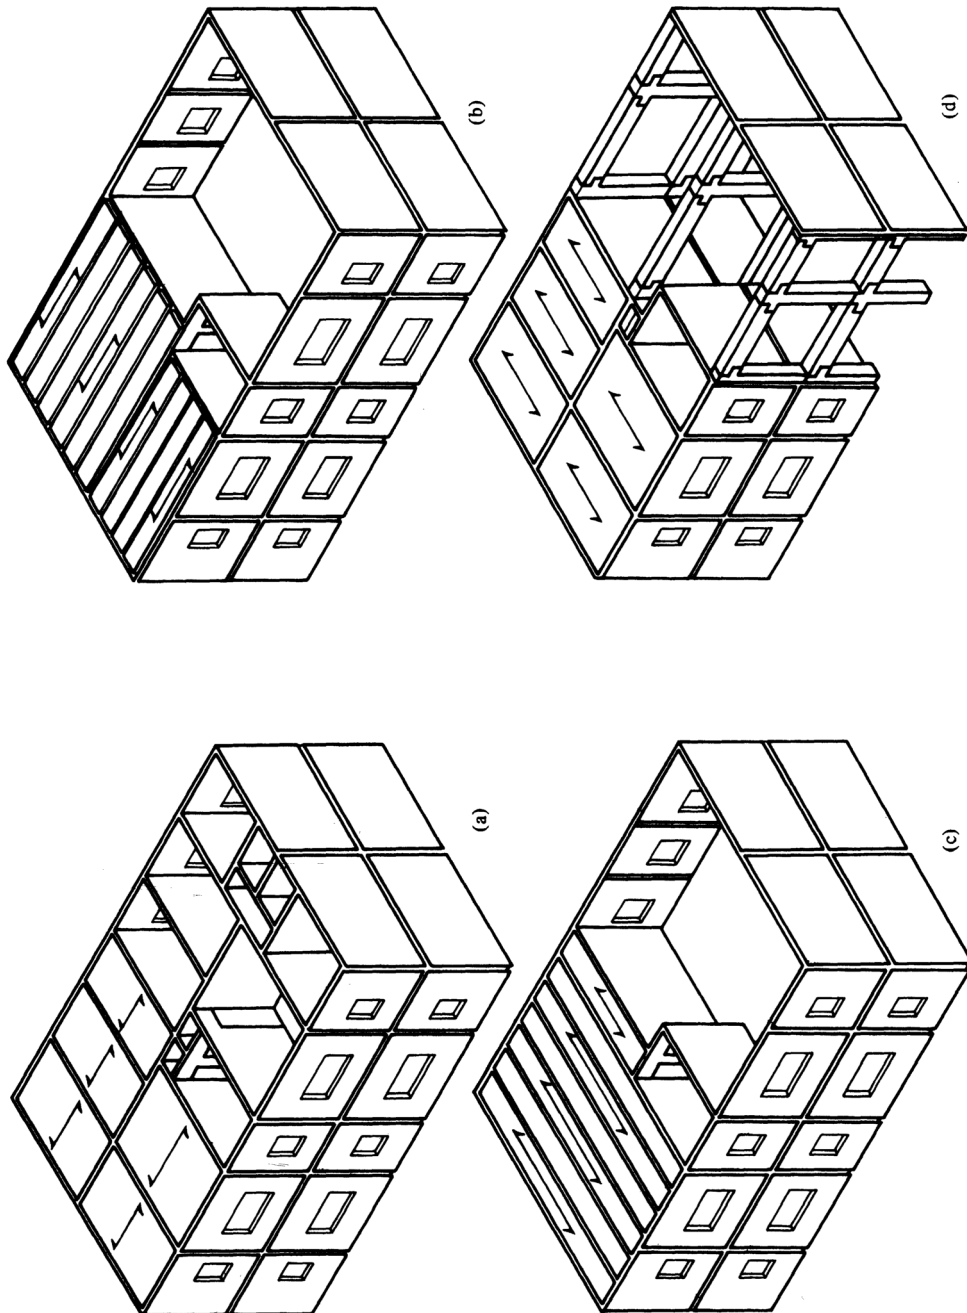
Different systems of planar elements: (a) room-size slabs on cross walls; (b) modular slabs on cross walls; (c) modular slabs on exterior walls; (d) slabs on beams and columns
